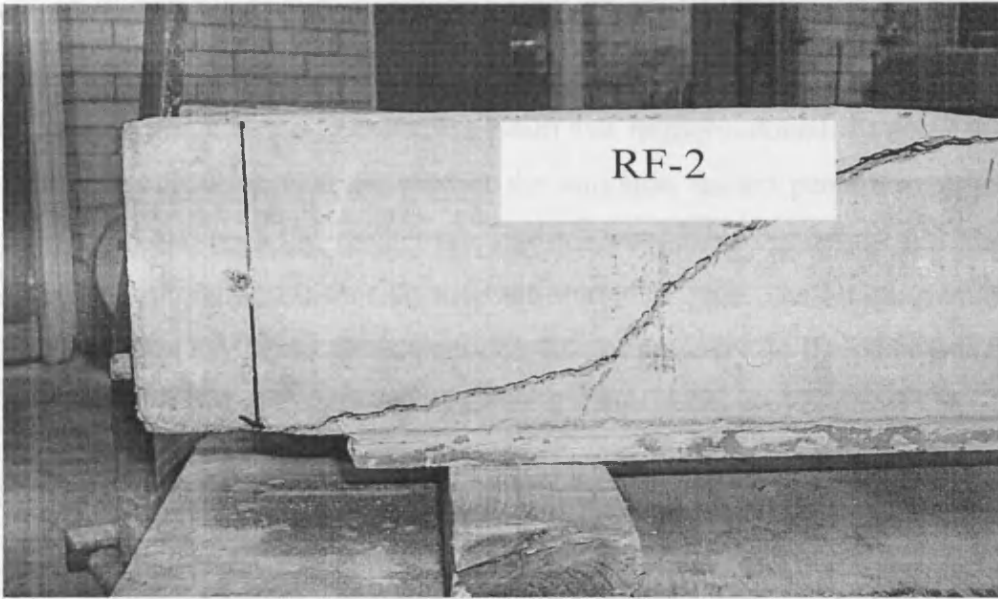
Typical shear failure in beams retrofitted with one strip on the tension face.
